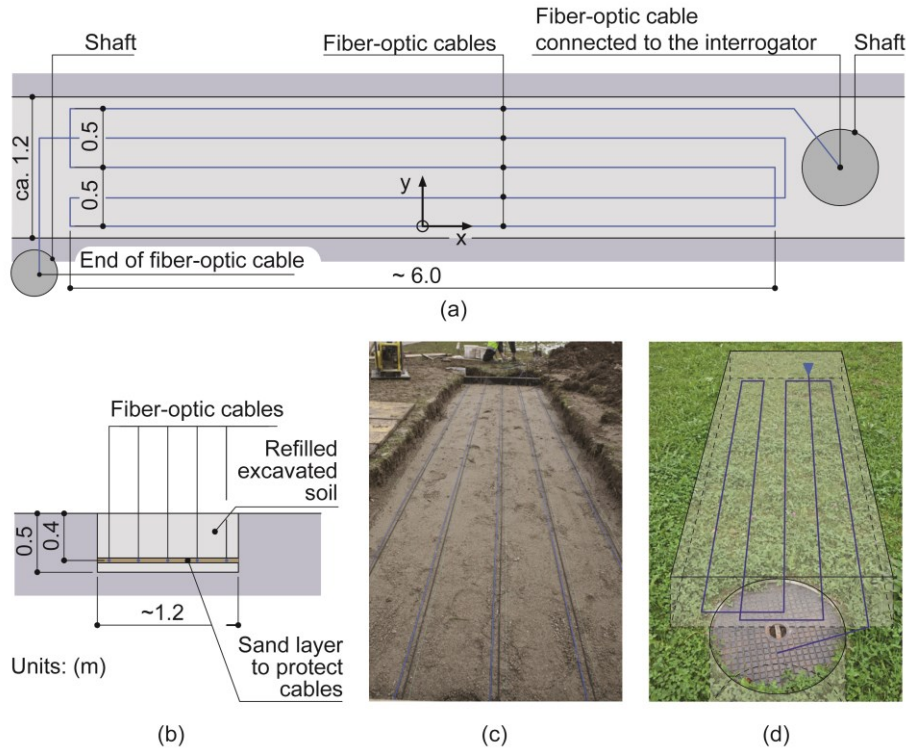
Experimental setup of the buried FOSs; (a) plan view; (b) cross-section; (c) FOSs during installation in the trench; (d) layout of the experiment after refilling the trench and grass grown over it.
